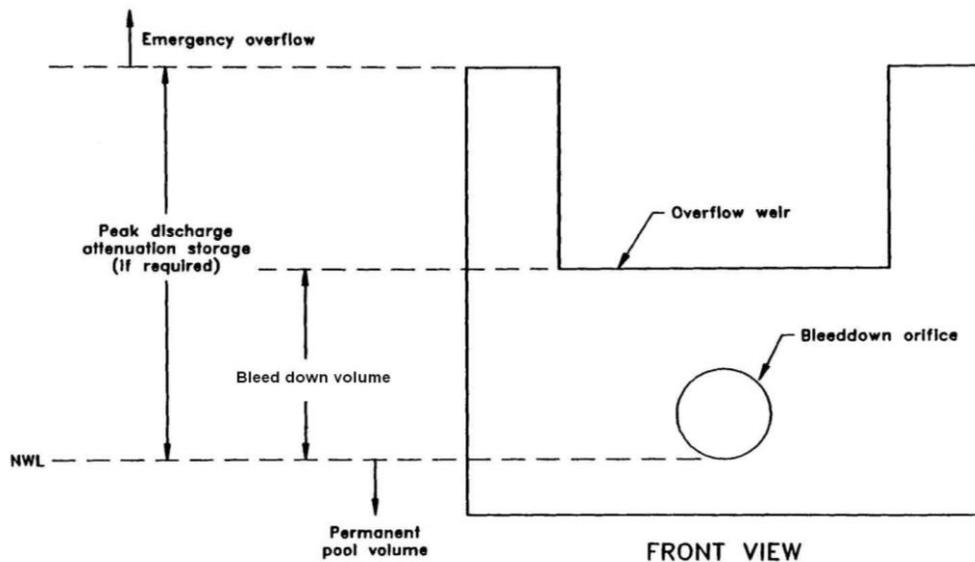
Typical Wet Detention Outfall Structure (N.T.S.).
